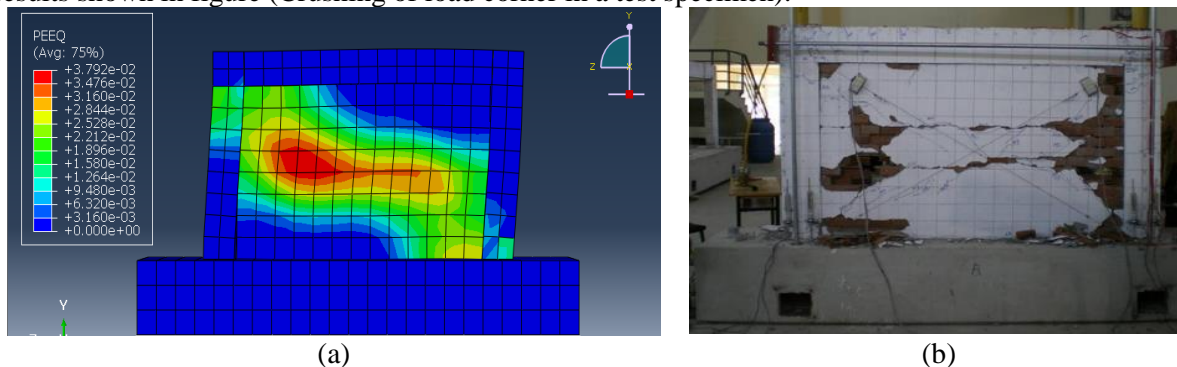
(a) deformed mesh of infill wall at failure, (b) Crushing of load corner in test specimen
